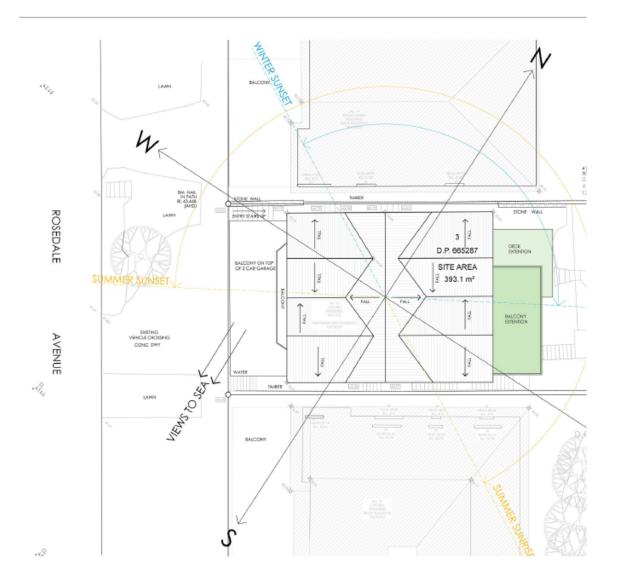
Demonstrating approval granted under DA2018/1062 with a ground floor deck extension and upper floor balcony extension leading to further areas of private open space (which are higher up due to the topography).
